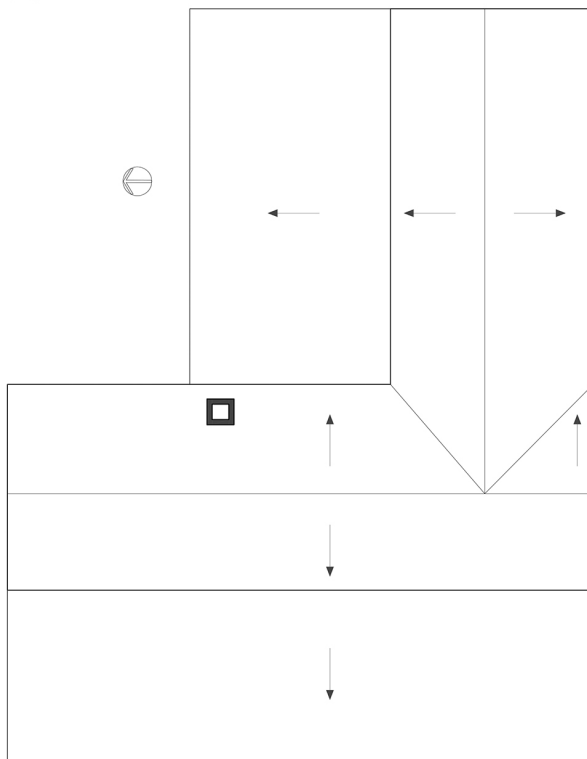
Plan of roof of Higdon Cabin. See Appendix for full-size drawing.
